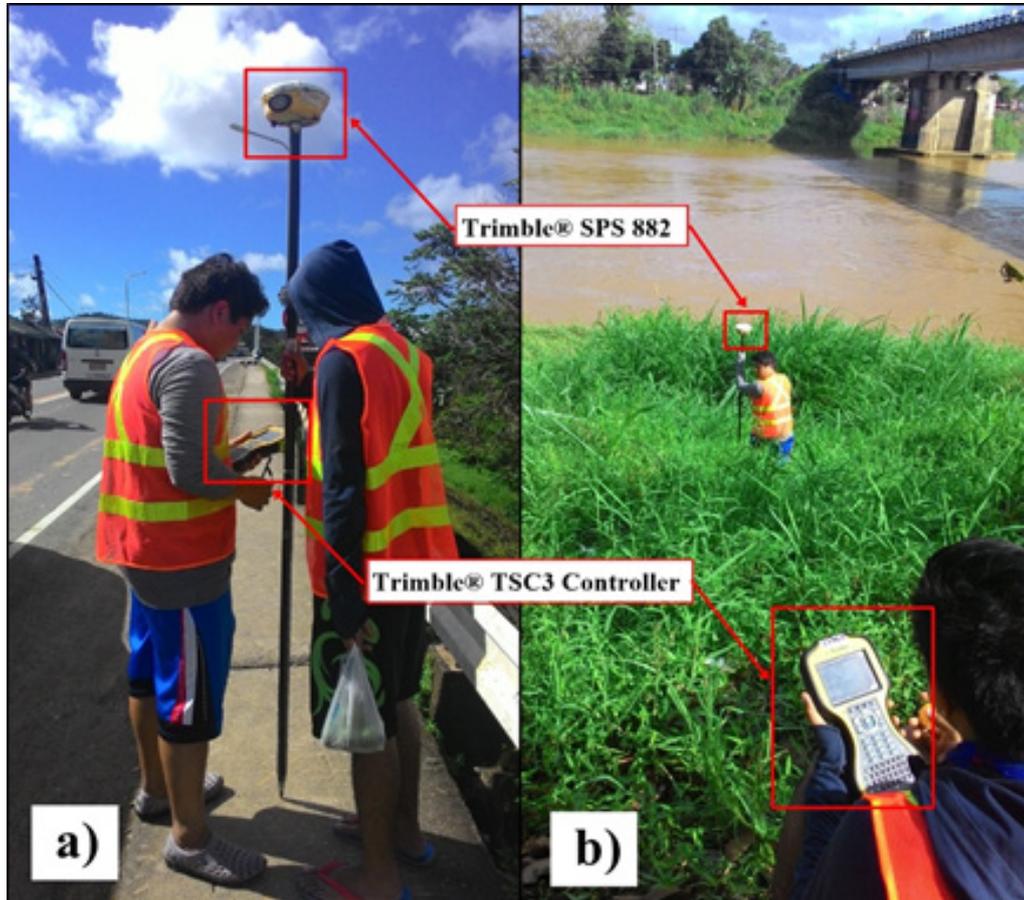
a) Bridge as-built and b) cross-section survey at the downstream side of Labo Bridge
